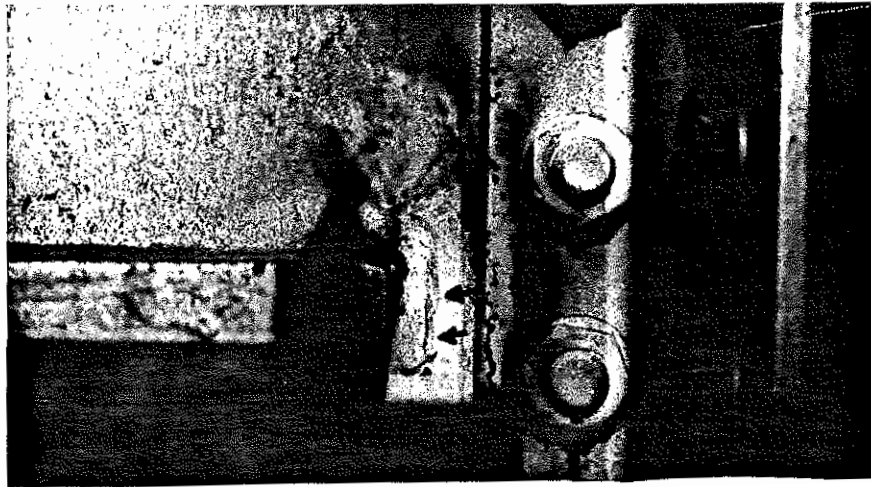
Crack in Floor Beam Web on the I-24 Bridge over the Tennessee River (1983).
